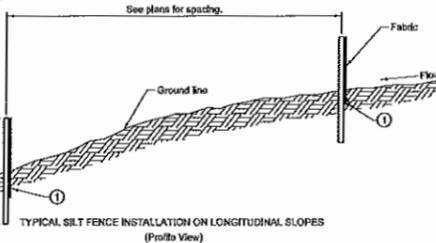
DETAILS OF SILT FENCE ON LONGITUDINAL SLOPES
